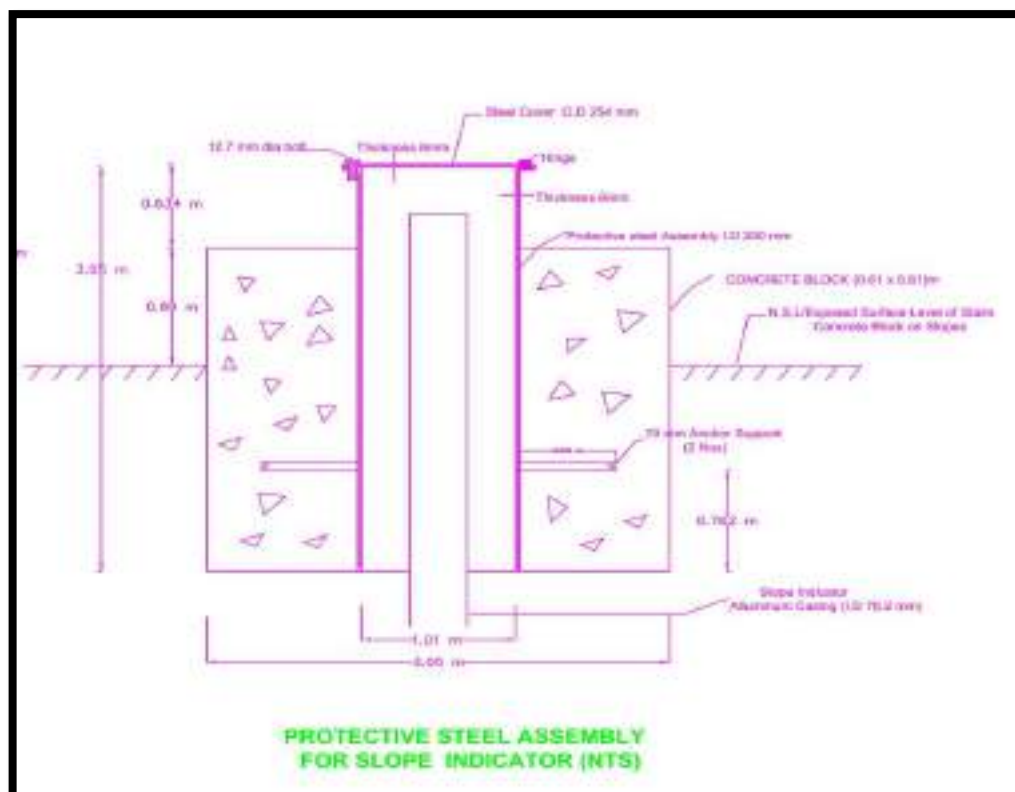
Cross Section details of Slope Indicator (cross section)
